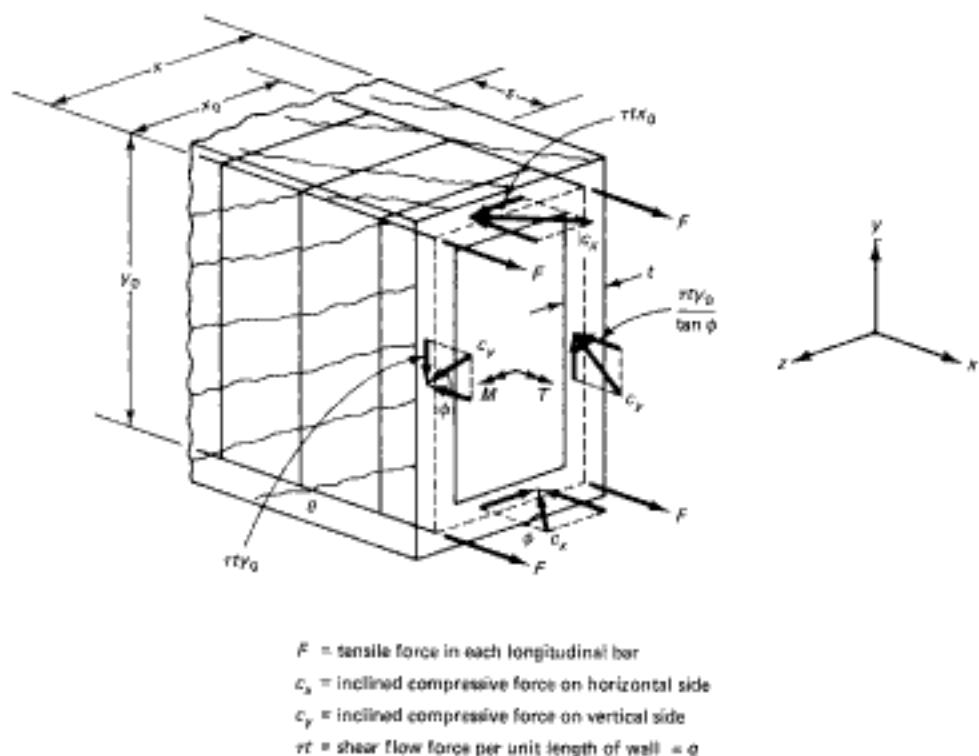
Forces on hollow box concrete surface by truss analogy.
